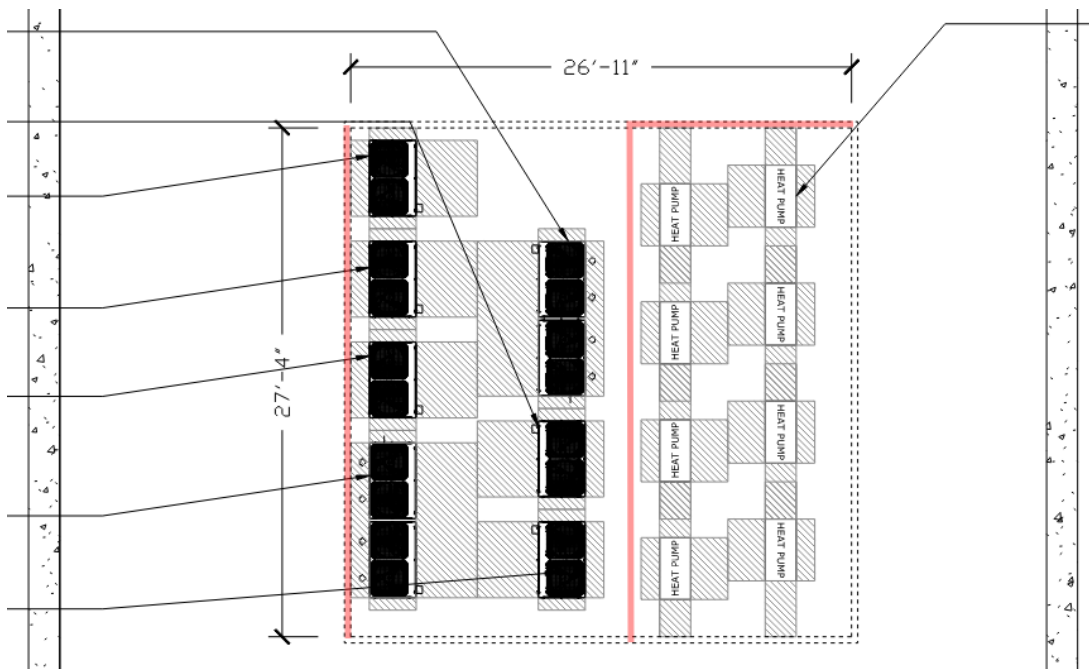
VRV Units and Heat Pumps on Rooftop of New Building 40
